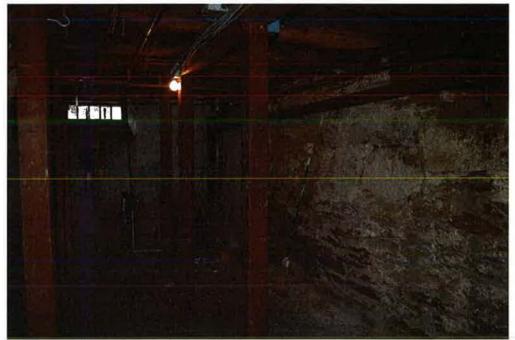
Cellar looking northwest, showing the west and north fieldstone foundation walls, floor joists, square wood posts installed in late twentieth or twenty-first century, and the five-light transom, where a full-size window at the north side of the foundation was once located.
